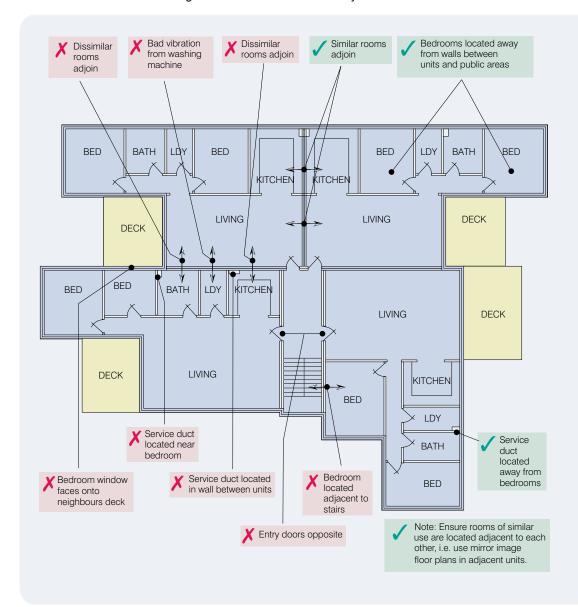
Good and bad sound design practices in building layout - plan view.
